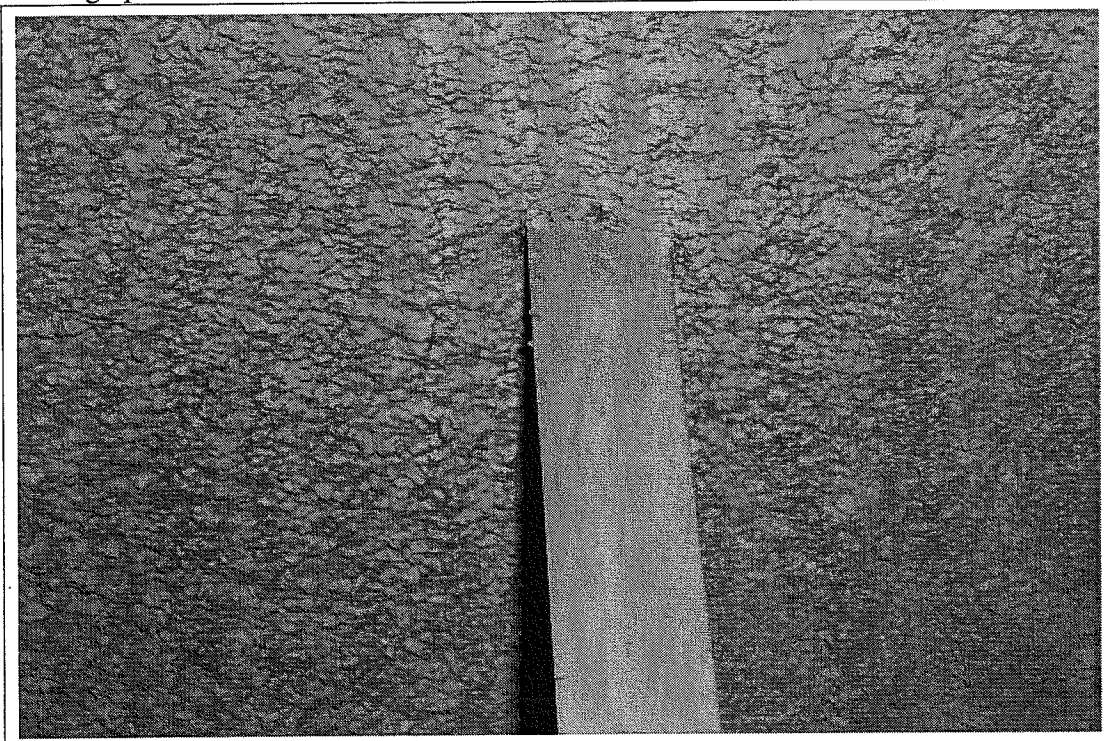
Basement, back hallway at janitors storage area - Duct support strap attached to acoustical plaster ceiling
